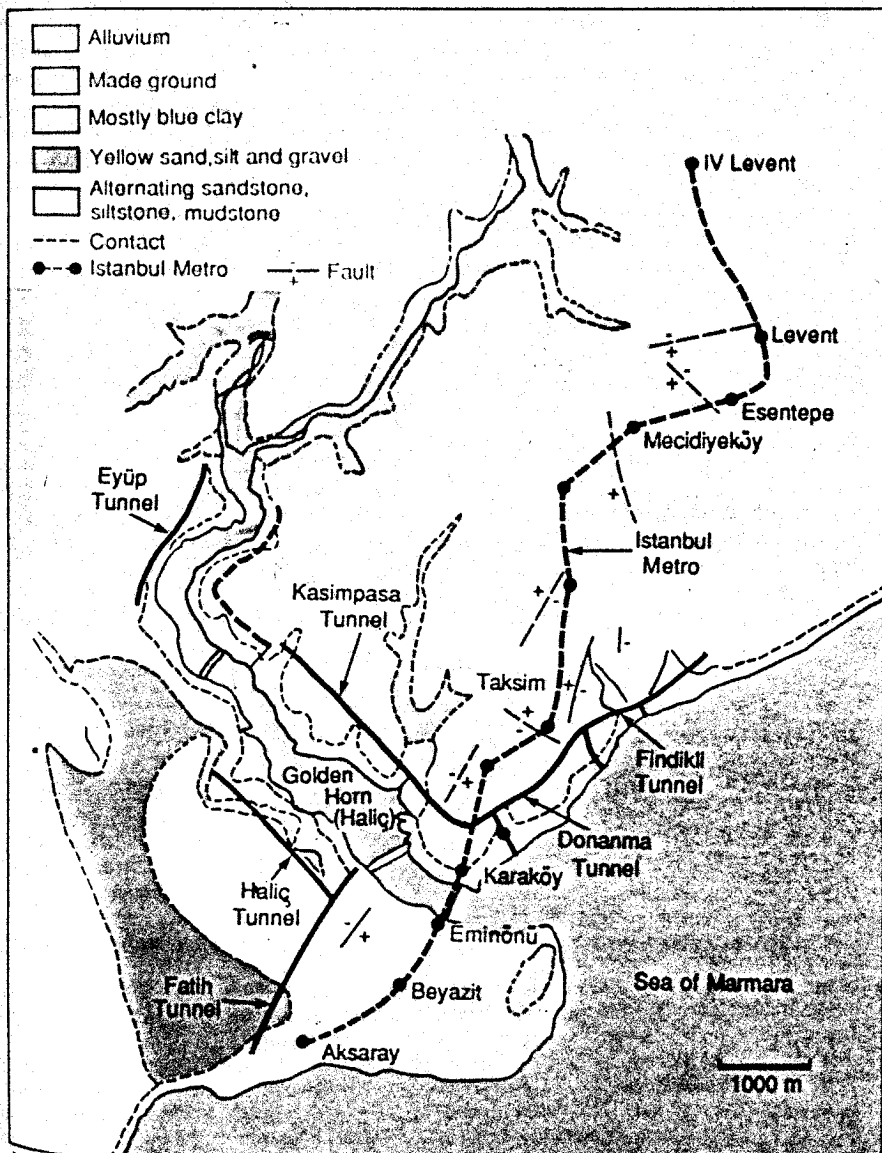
Plan of Golden Horn sewerage tunnels and possible line of the Istanbul Metro.
